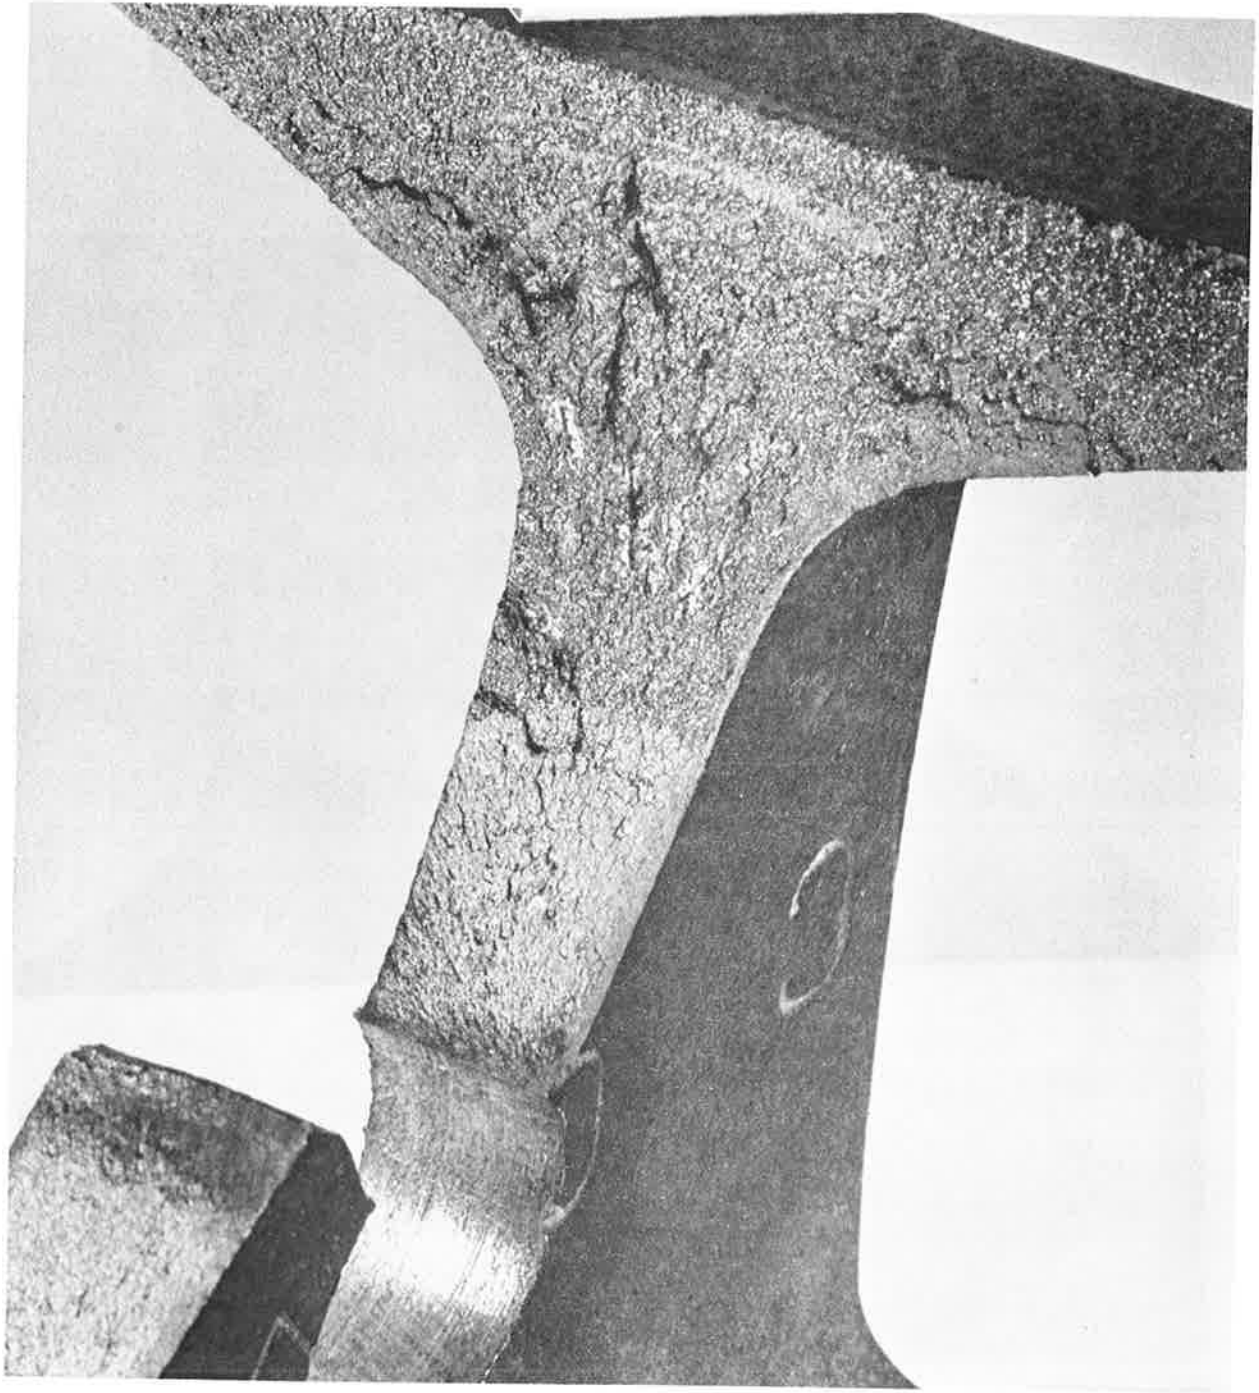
Specimen 6B-6: View of Fracture at Bolt Hole
